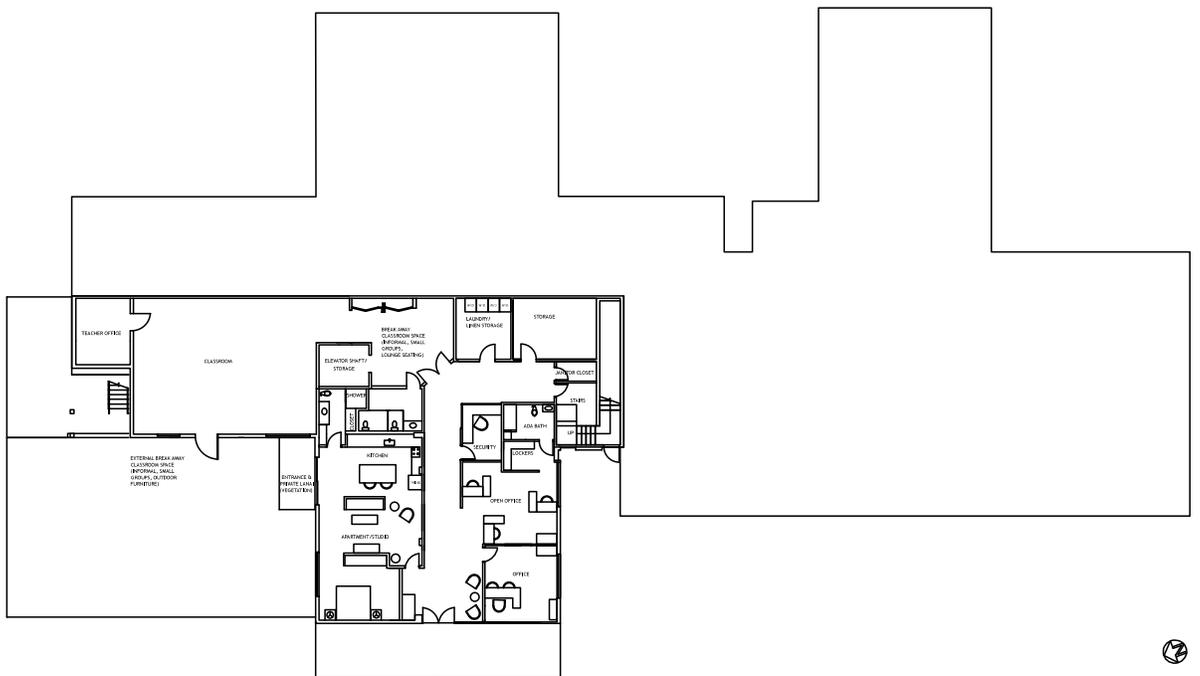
Proposed 1<sup>st</sup> Floor Plan.
